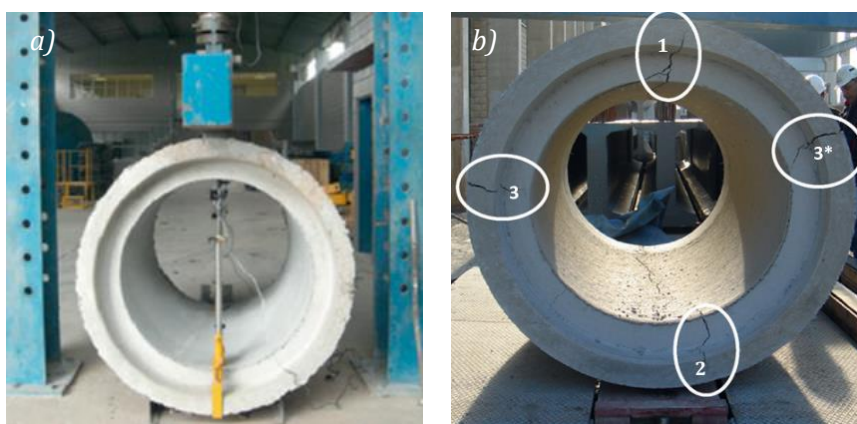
a) Crushing test and b) crack pattern in SFRC.
